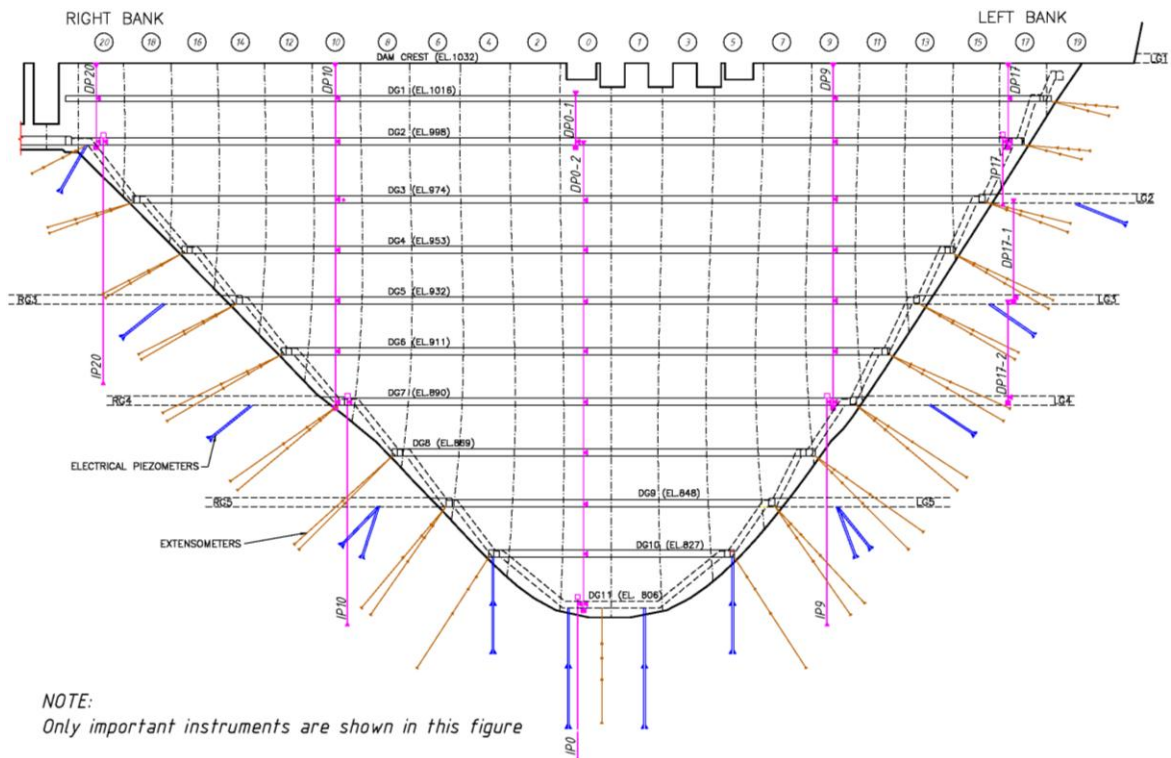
Main instrumentation of the Karun 4 dam and its foundation (dam D/S profile)
